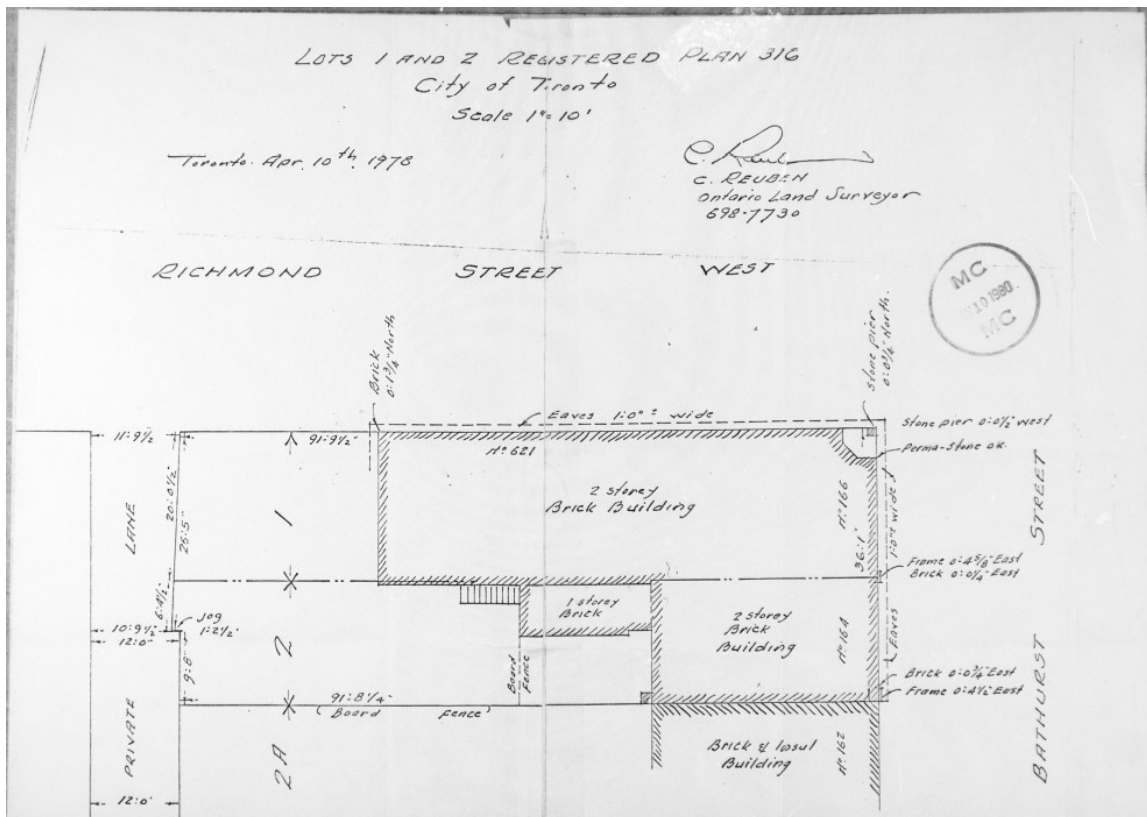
Site plan of 164-166 Bathurst Street (present-day 164 Bathurst Street) prepared by C. Reuben, Ontario Land Surveyor, 1978. (City of Toronto Building Records.)
